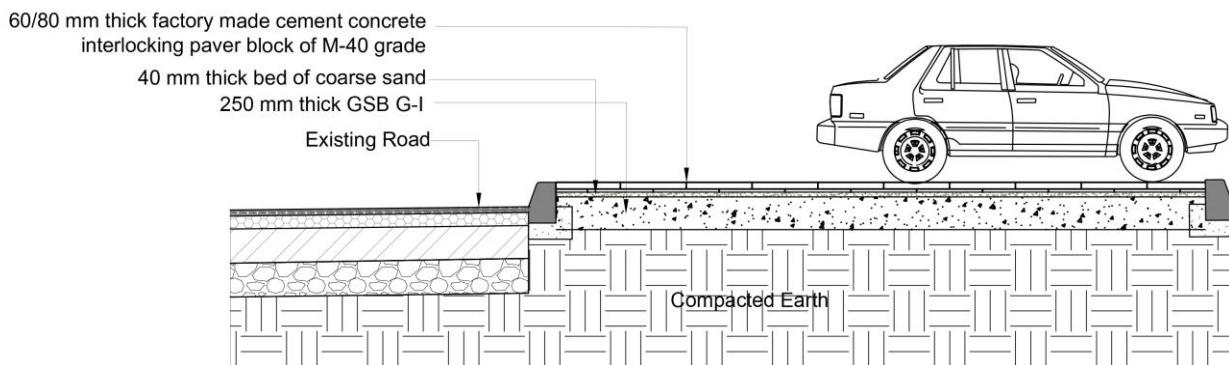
Typical detail of Interlocking Pavers as per IRC guidelines
